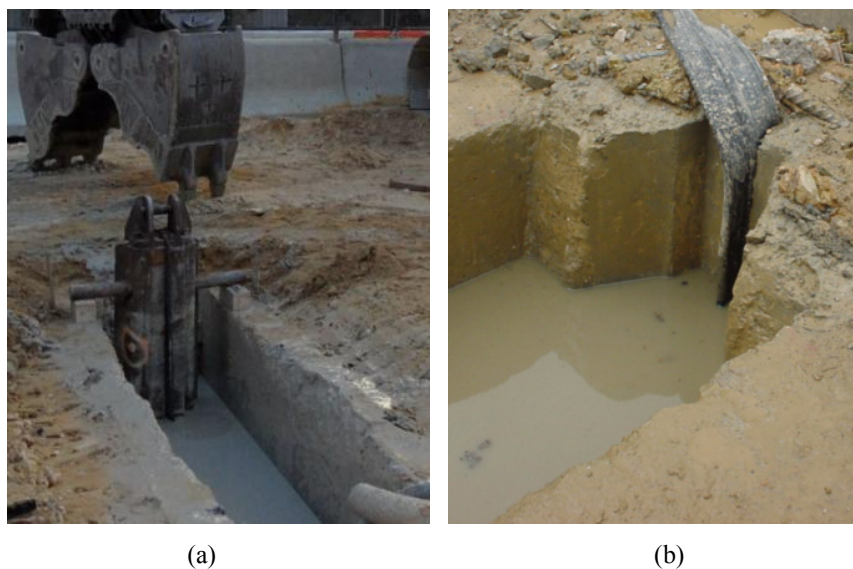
(a) CWS water stop installed in a primary panel and (b) watertight joint visible after excavation of the secondary panel
